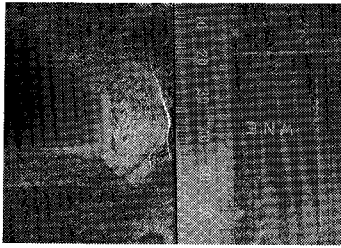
Fatigue Crack in Web Gusset Joint.
